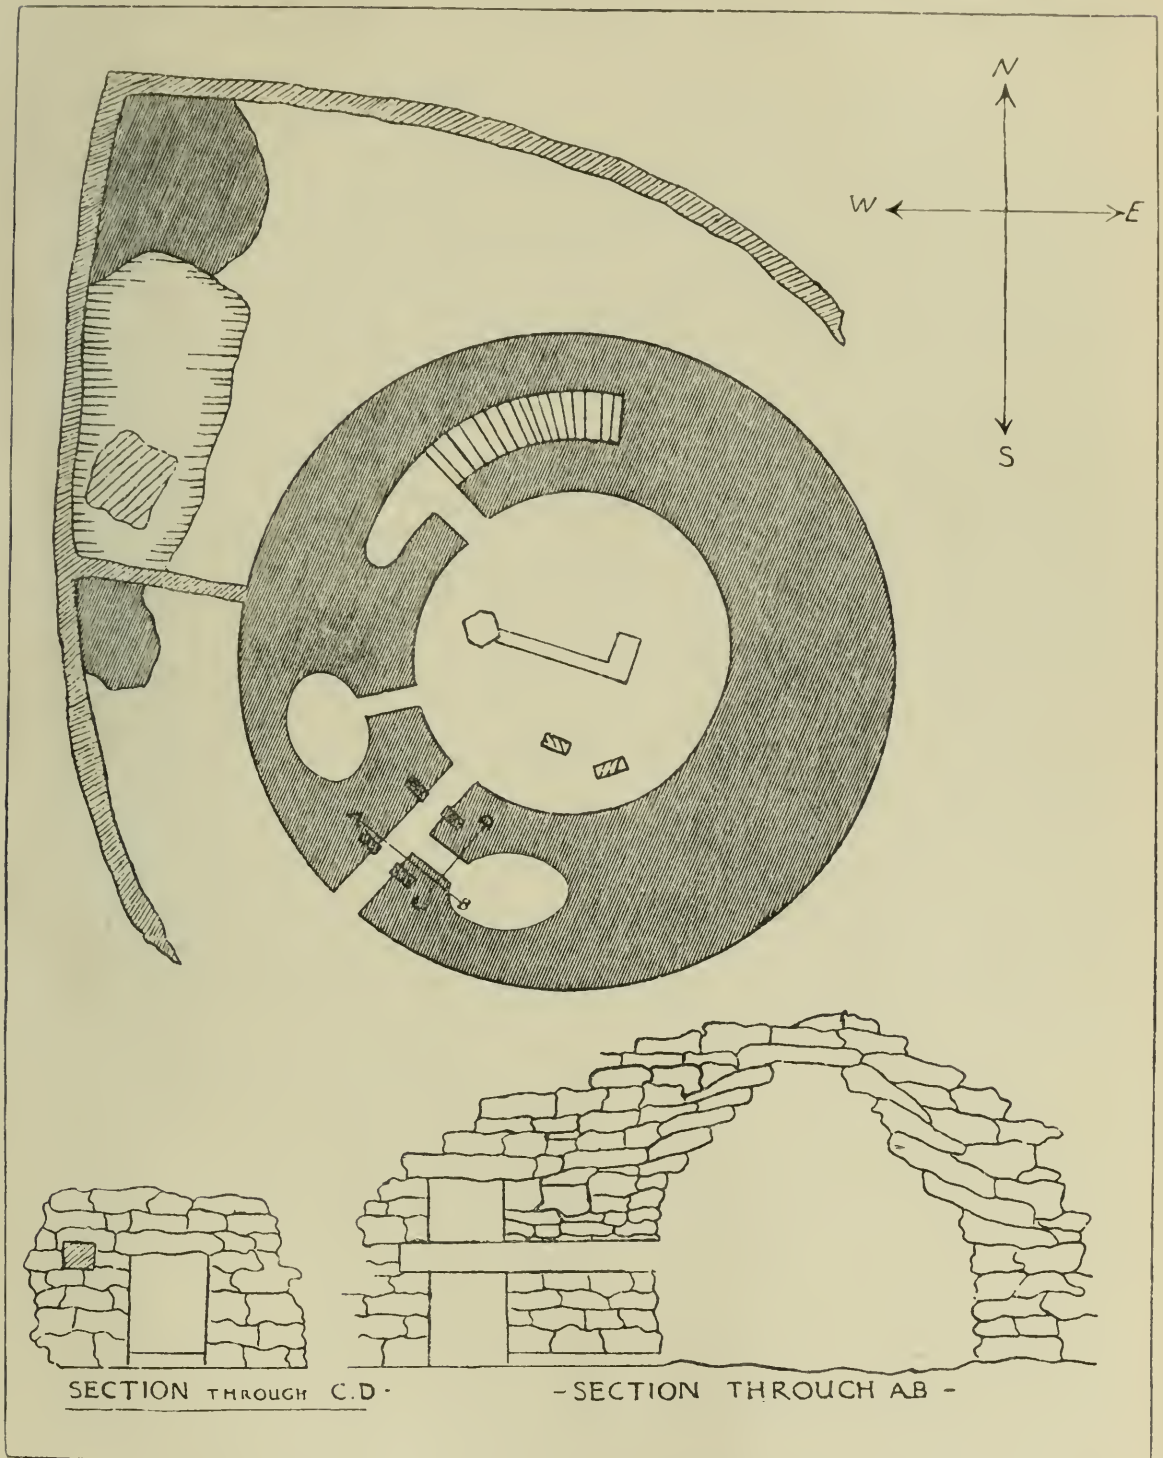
Broch, Ousedale Burn (No. 204); Ground-plan and Sections.
